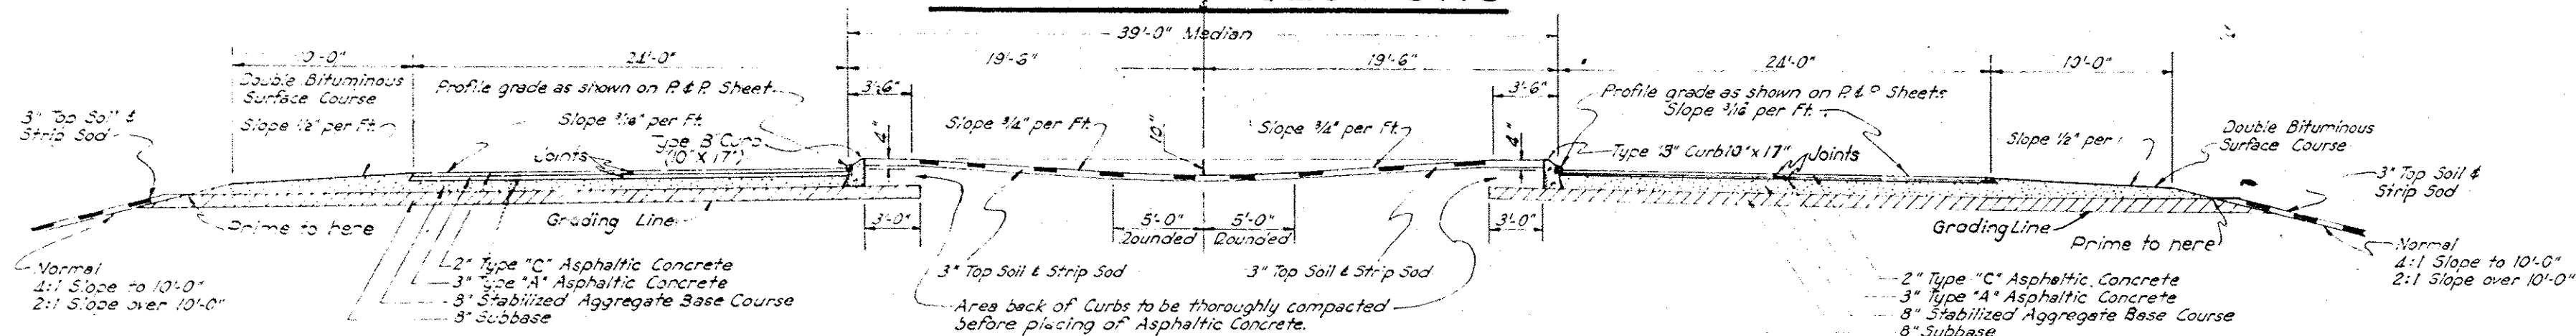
DETAIL RAMP & COLLECTOR ROAD WITH SHOULDER
